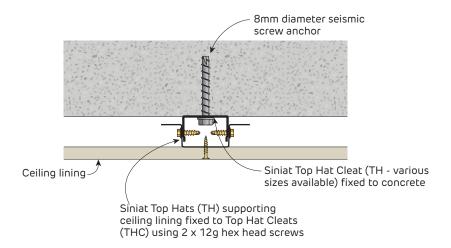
Internal or External Top Hat Ceiling under Concrete
